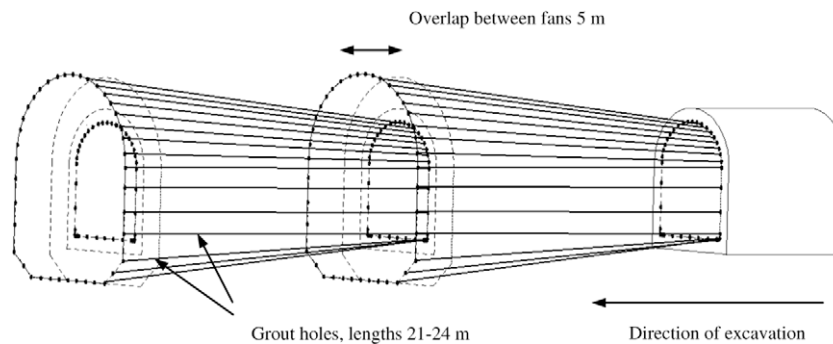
Schematic illustration of two grout fans. Grouting class A had 10 holes whereas the B and C classes had 20 holes arranged around the tunnel periphery. (Adapted from Butrón 2009).
